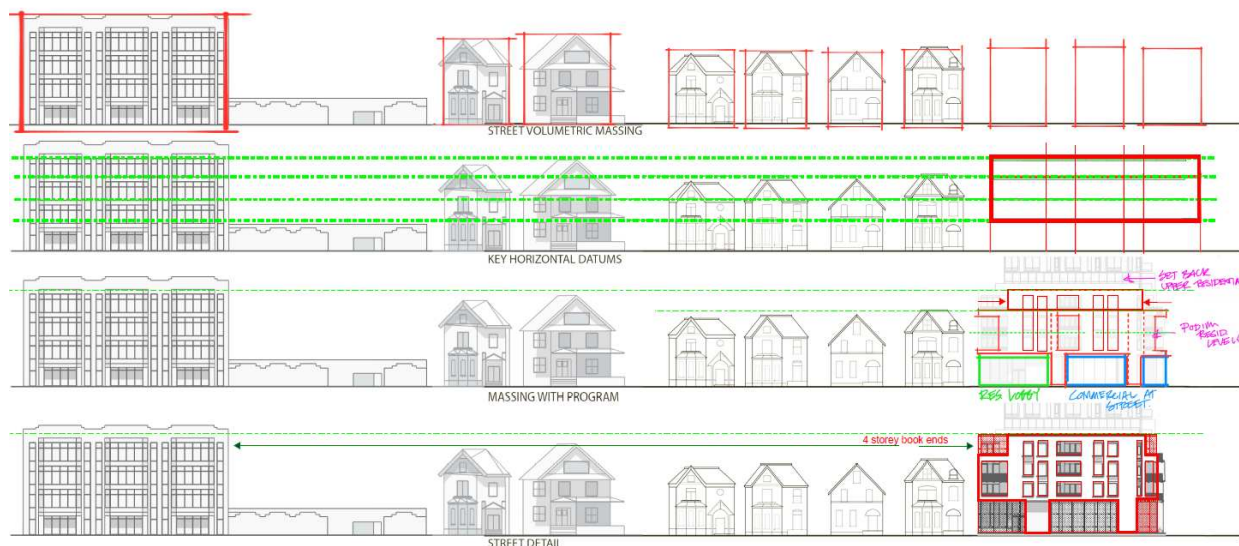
Street context illustrating the planned development in relation to the existing buildings on the north side of Somerset Street. The 4-storey podium and the corner building at Bank Street establish a scale and frame the six residential buildings in between. The cadence and the rhythm of the 2 1/2 storey buildings are interpreted in terms of datum lines, street volume and massing. The use of red brick cladding also unifies the block. Source: Furr Architects Collective.
